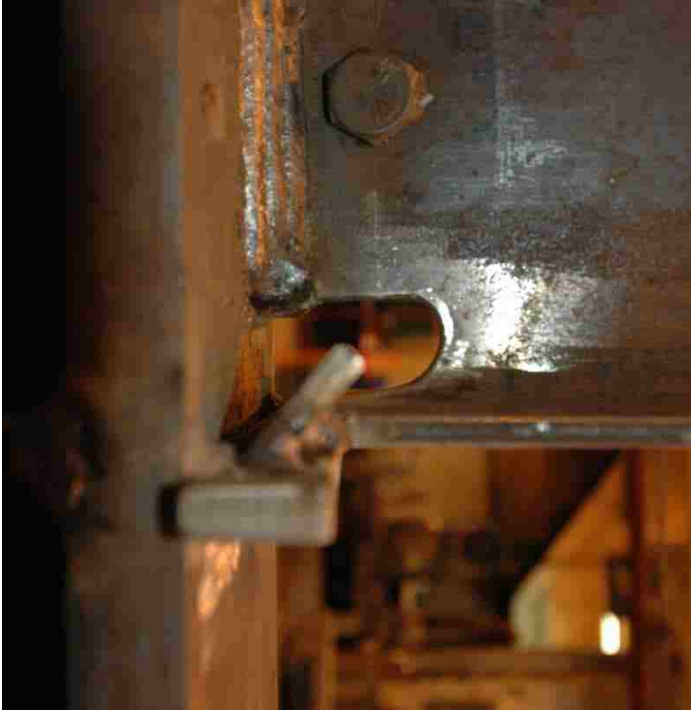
2nd Floor Beam Bottom Flange with Run Off Tabs in Place Prior to Welding
